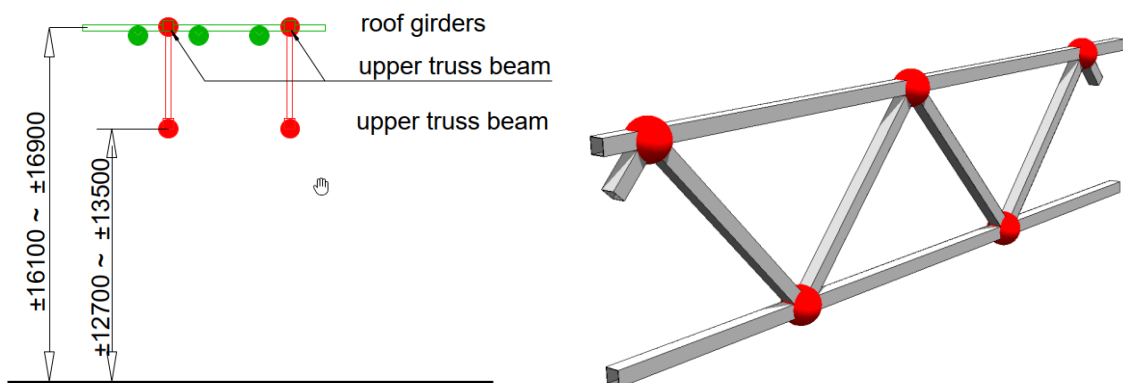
West Hall suspension points to girders (●) and upper/lower beam (●) in cross-section and isometry
